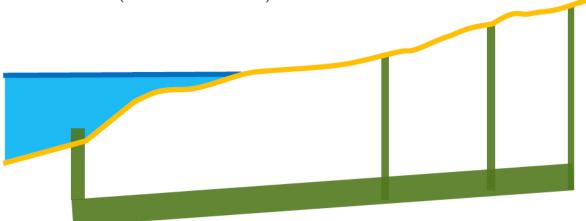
Preliminary concept of tunnel alignment and inlet and outlet structures
